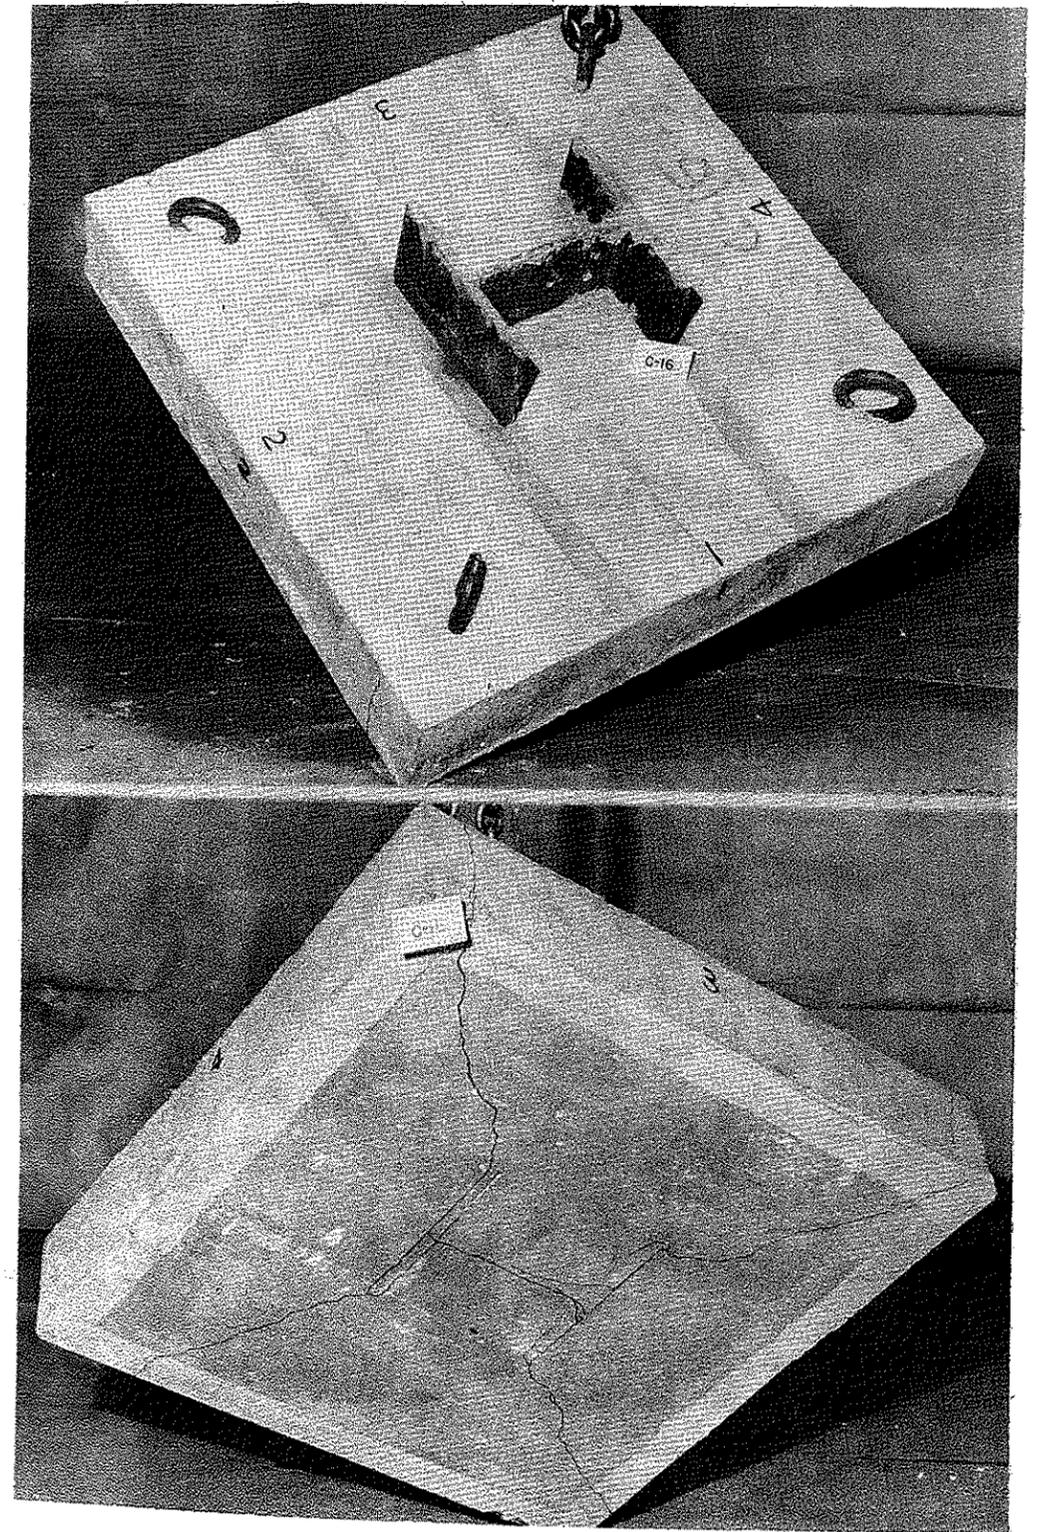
APPEARANCE OF SPECIMEN C-16 AFTER TESTING.
